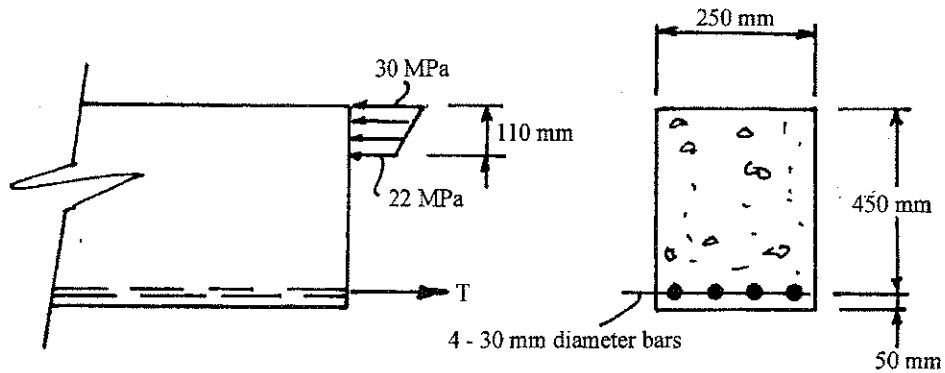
P7 Reinforced concrete beam in subjected to bending moment
